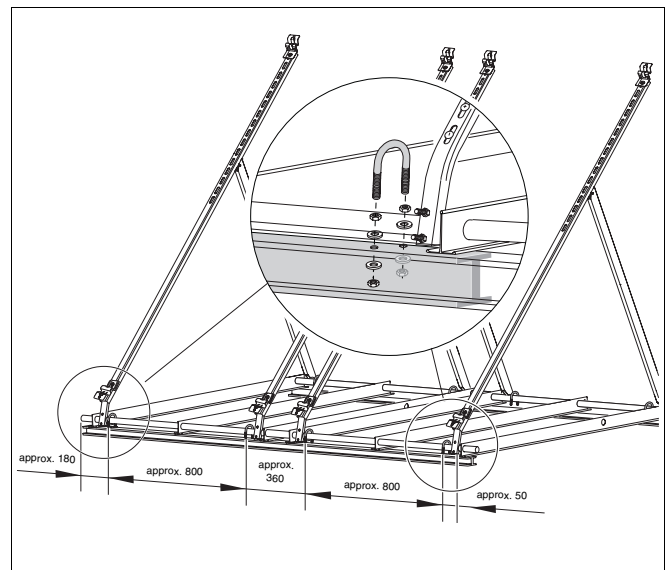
Fix flat roof stands to girders with U-bolts (dimensions in mm)
